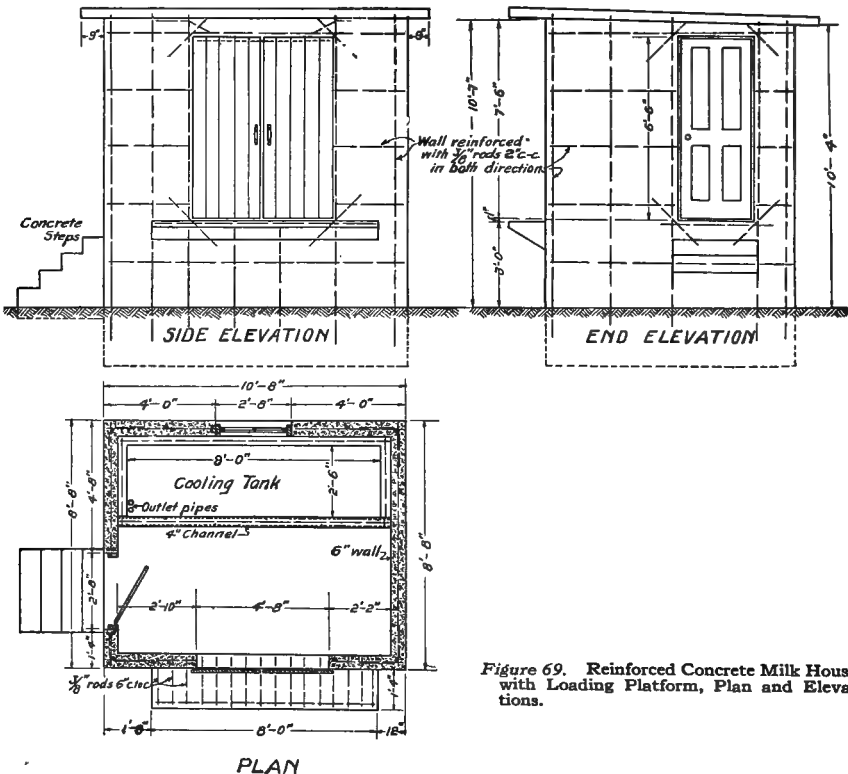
Reinforced Concrete Milk House with Loading Platform, Plan and Elevations.
